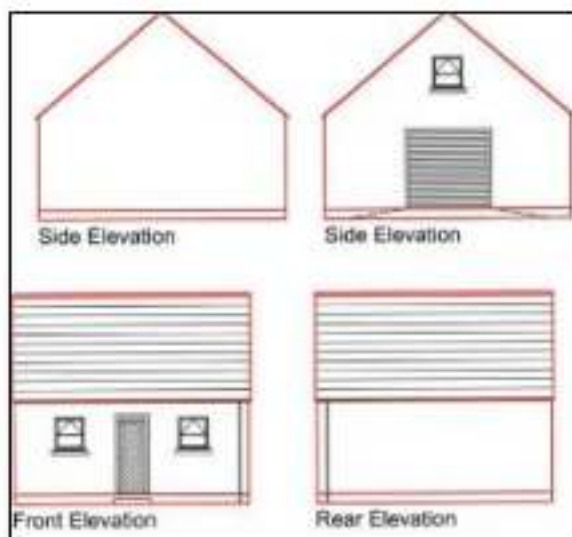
Extract from Garage Elevations J Fegan 1 (application number LA07/2022/1534/F)
